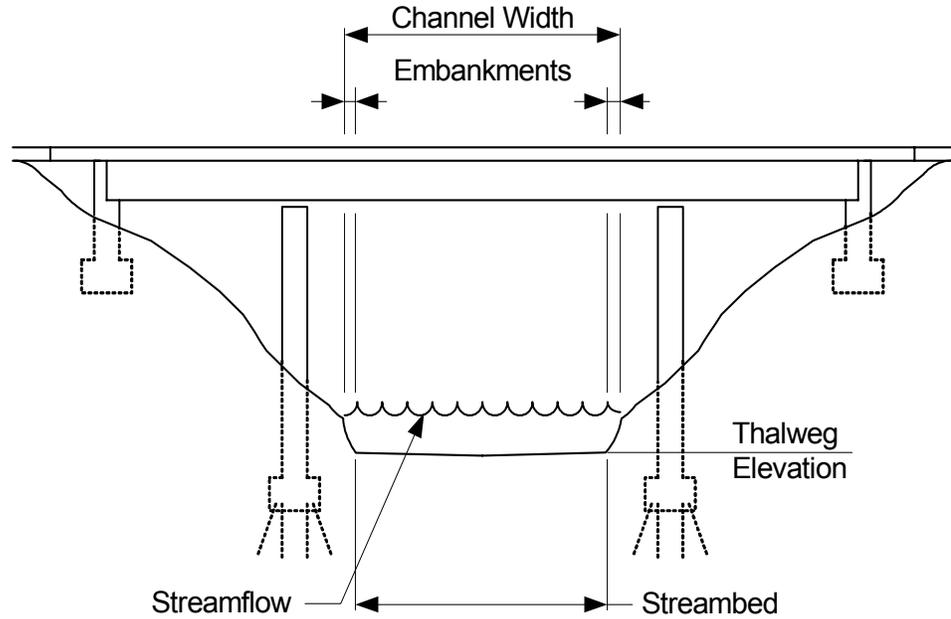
Typical Waterway Cross Section Showing Well Defined Channel Depression
